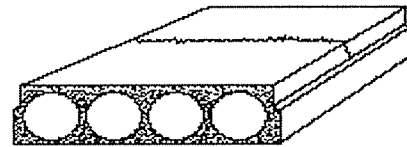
Causes of Transverse Cracks in Prestressed Hollow Core Slabs (PCI, 1983)
